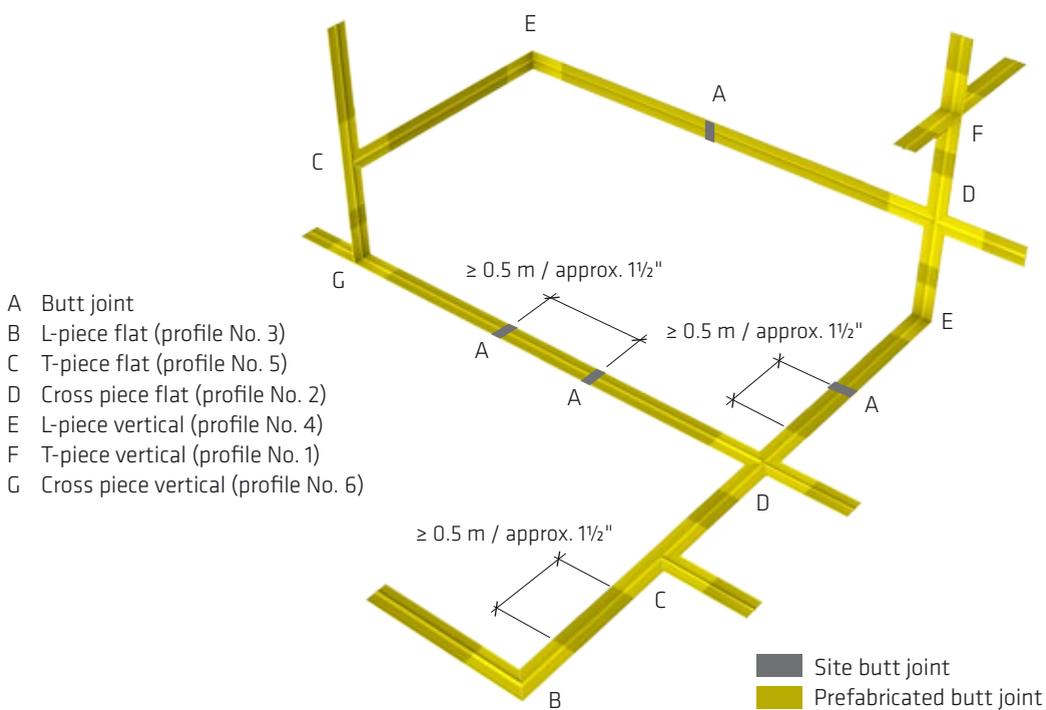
Minimum spacing for prefabricated and site joint layout
